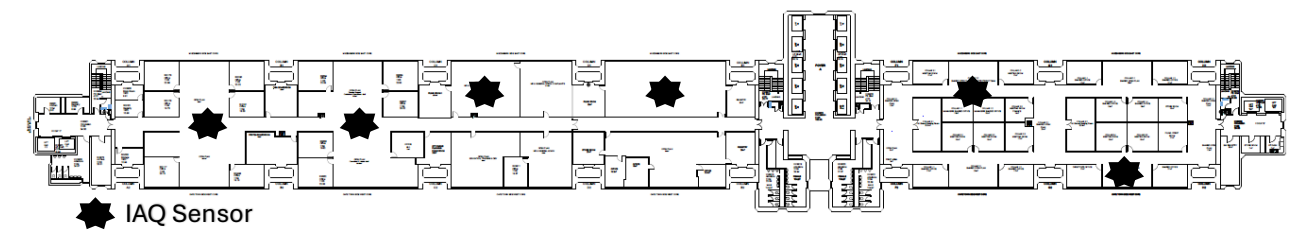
Tower Building proposed sensor positioning 12th floor (6)
